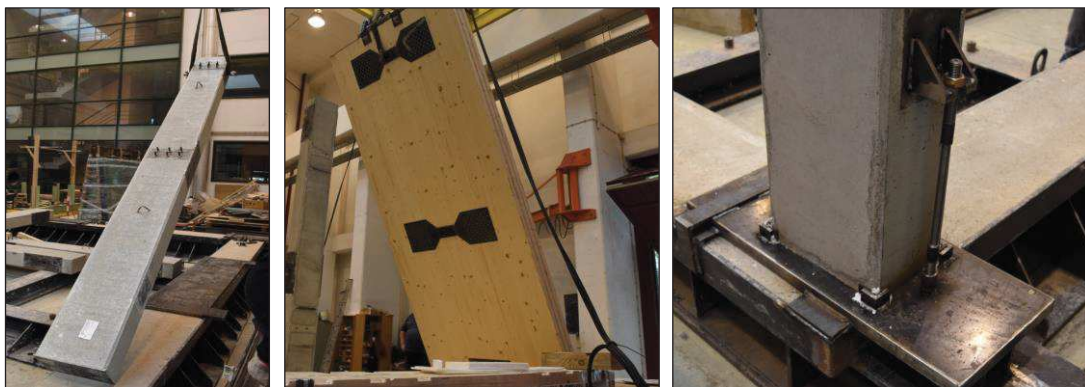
Phase 2:* Lifting of concrete columns (left) and walls (centre); detailing of the column base connection (right).
